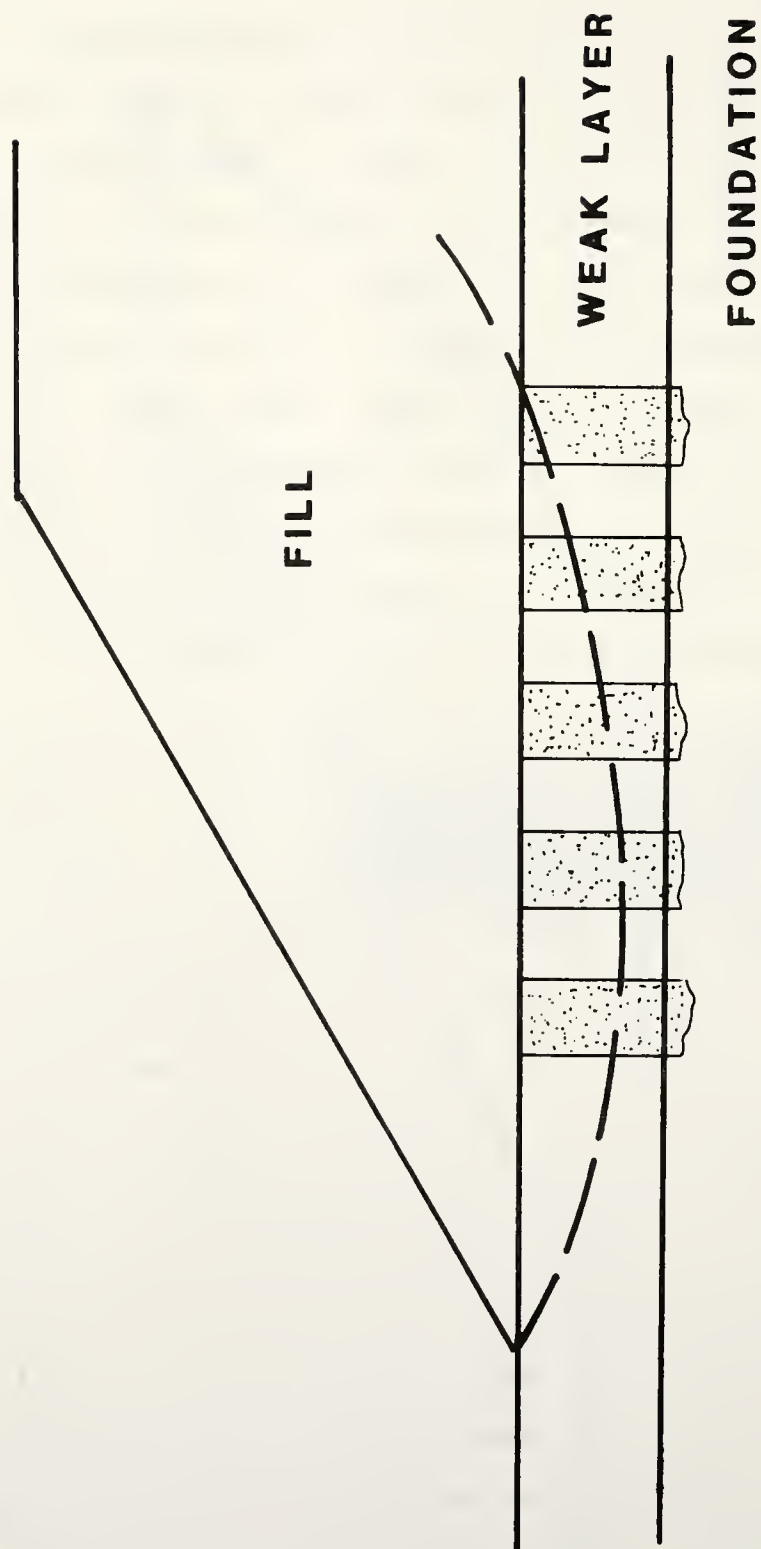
Stone Columns Used to Stabilize an Embankment
